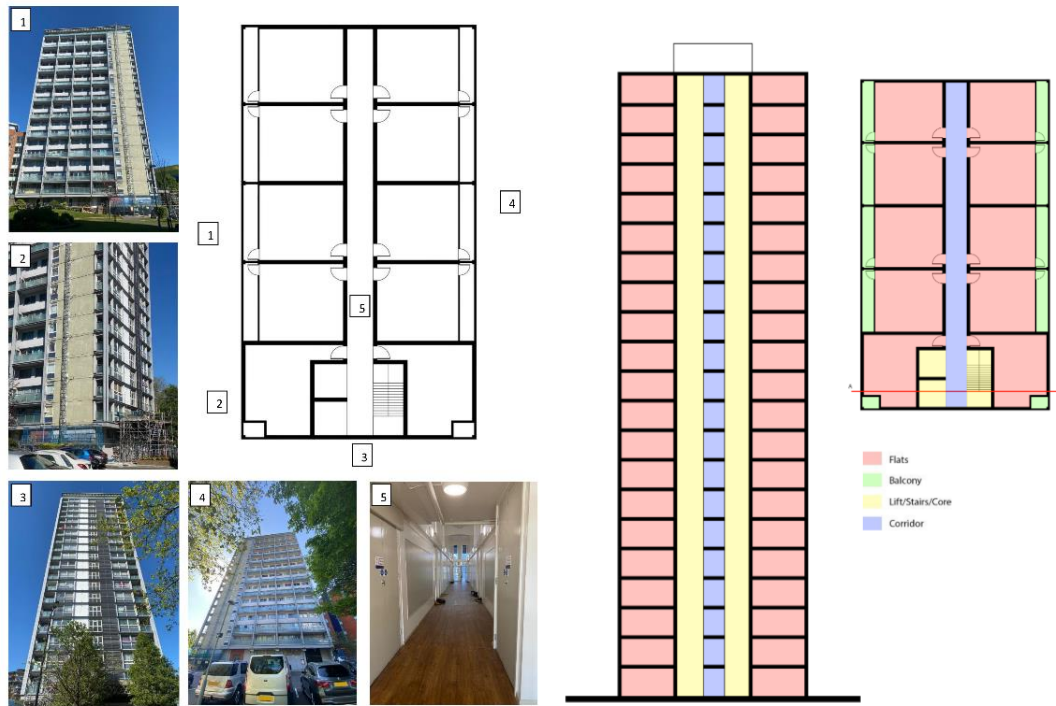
The case study building “Polesworth house”; an approximate section and plan.
